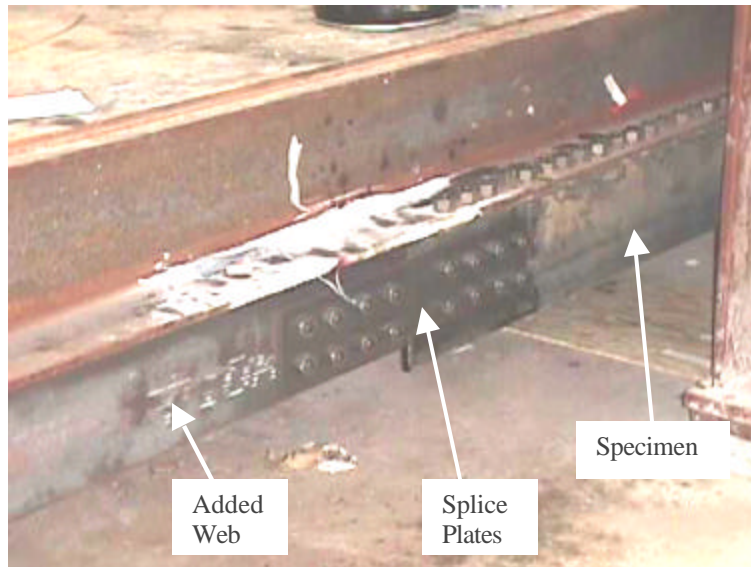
Splice plates bridging the gap between specimen and web mounted below W section.
